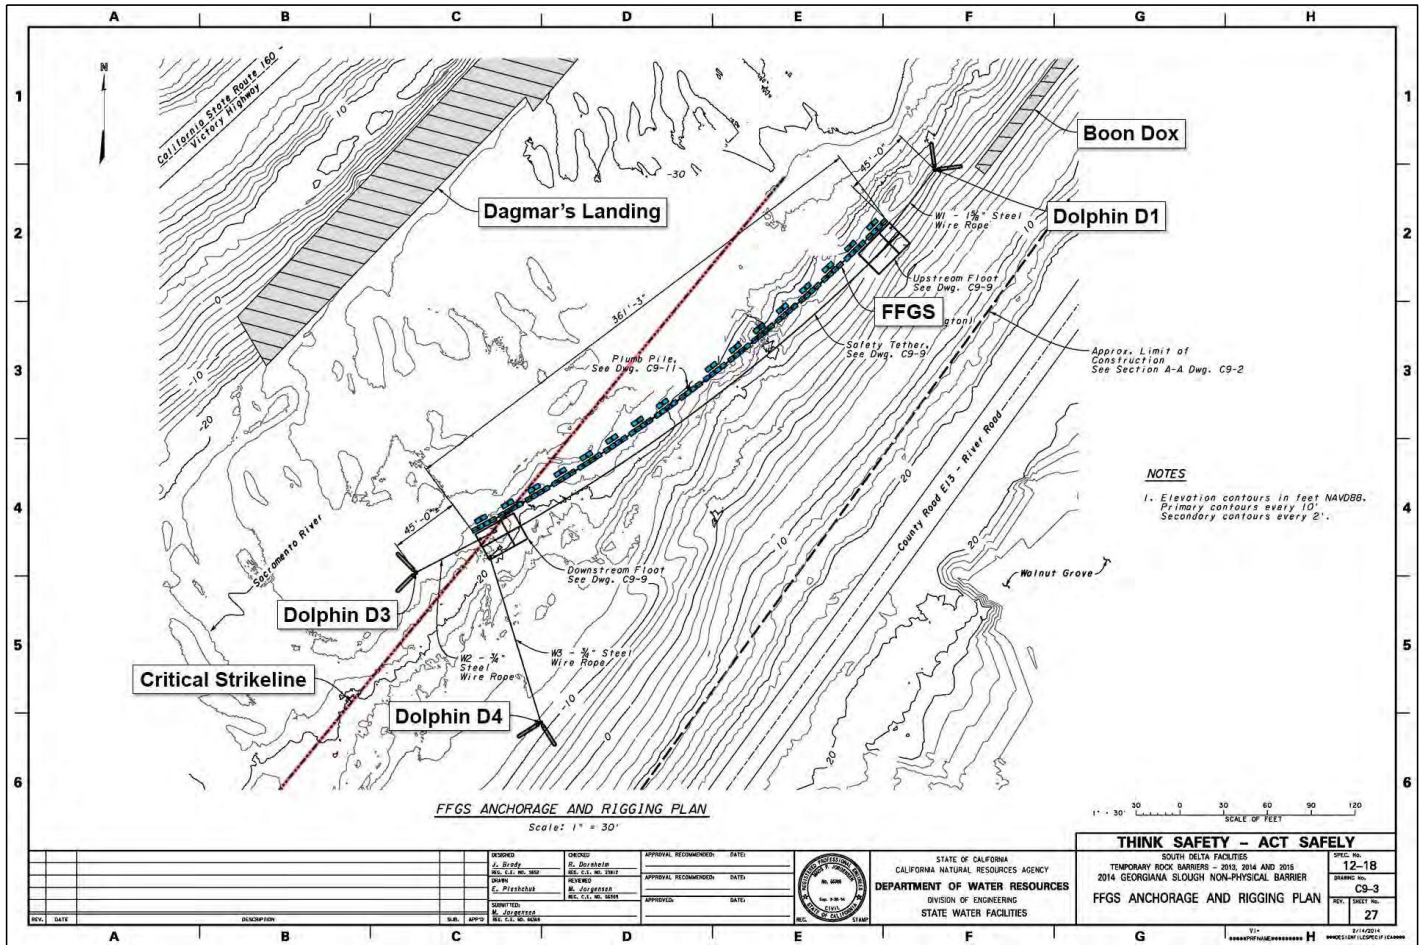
2014 Floating Fish Guidance Structure Layout Plan
